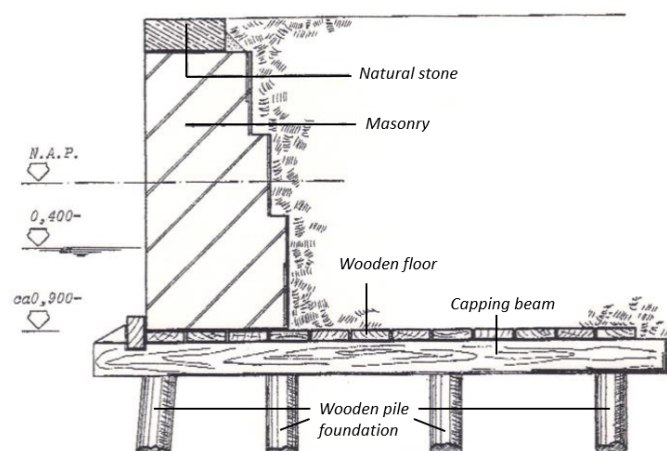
A gravity wall on a wooden pile foundation (IBA).
